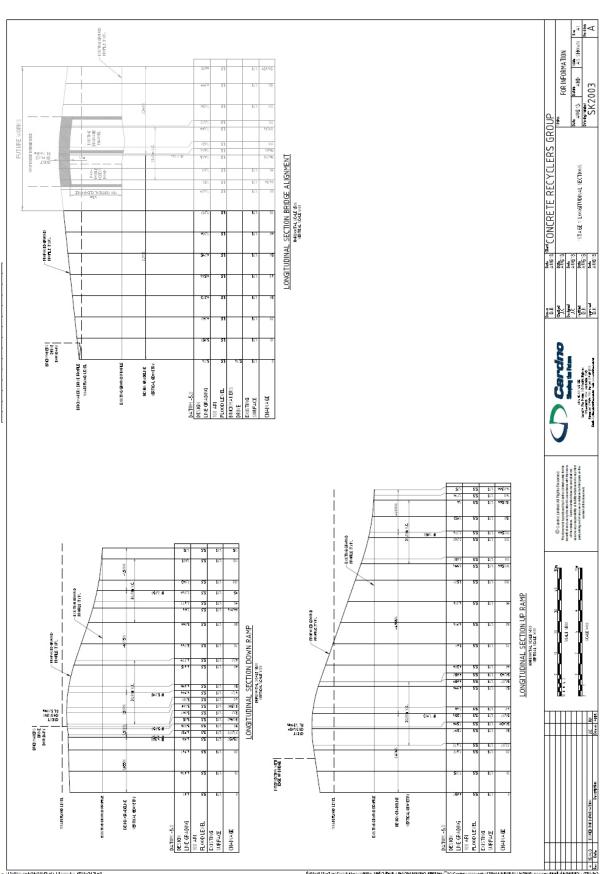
Longitudinal sections of the Stage 1 construction works.
